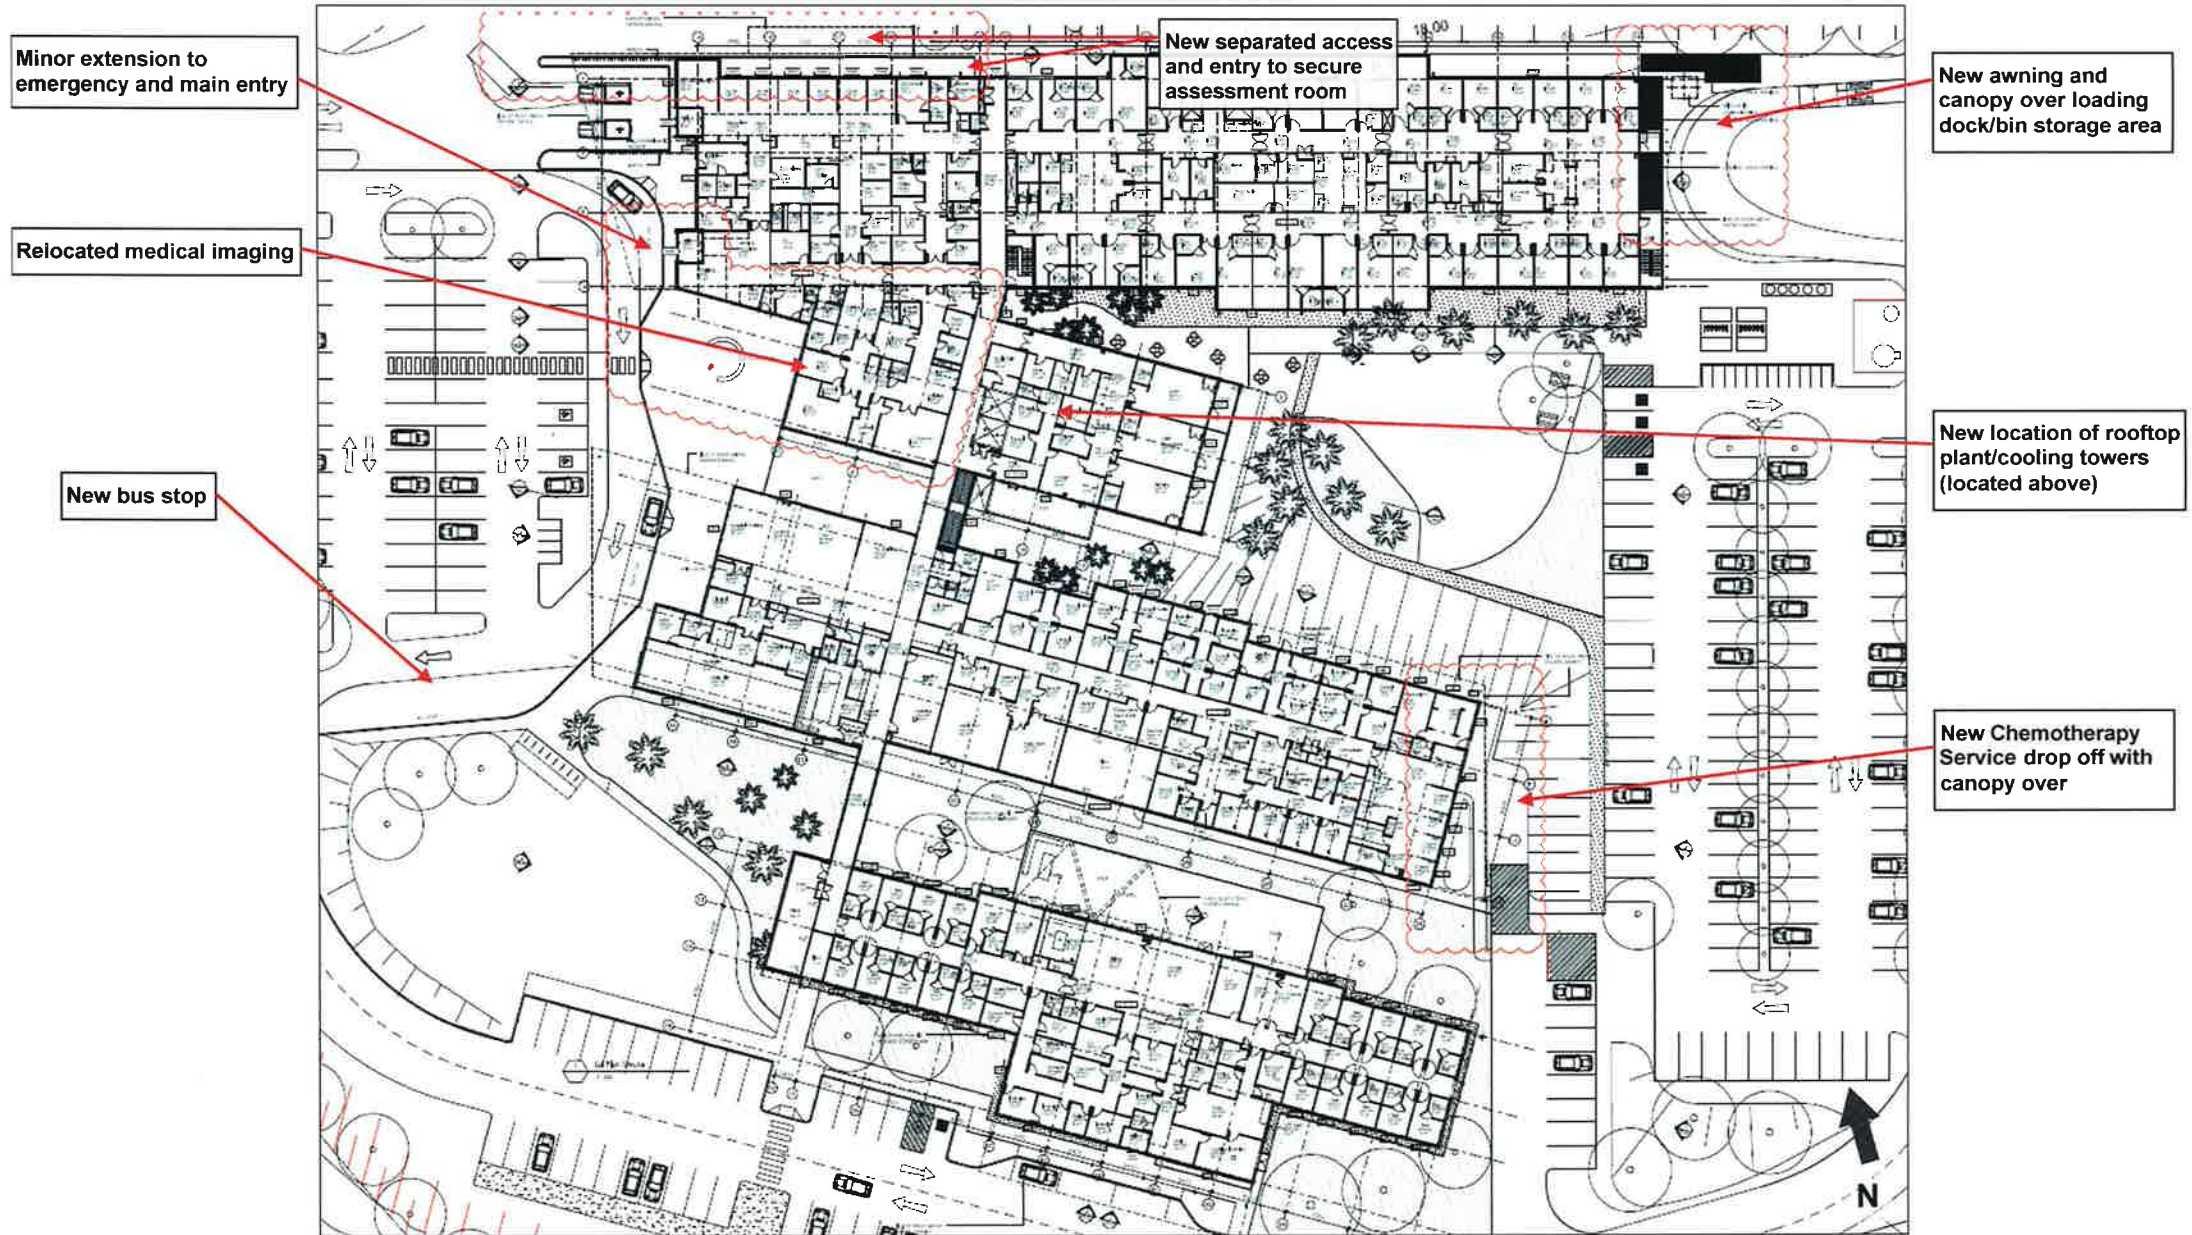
Proposed Ground Floor Plan (changes outlined in red)
